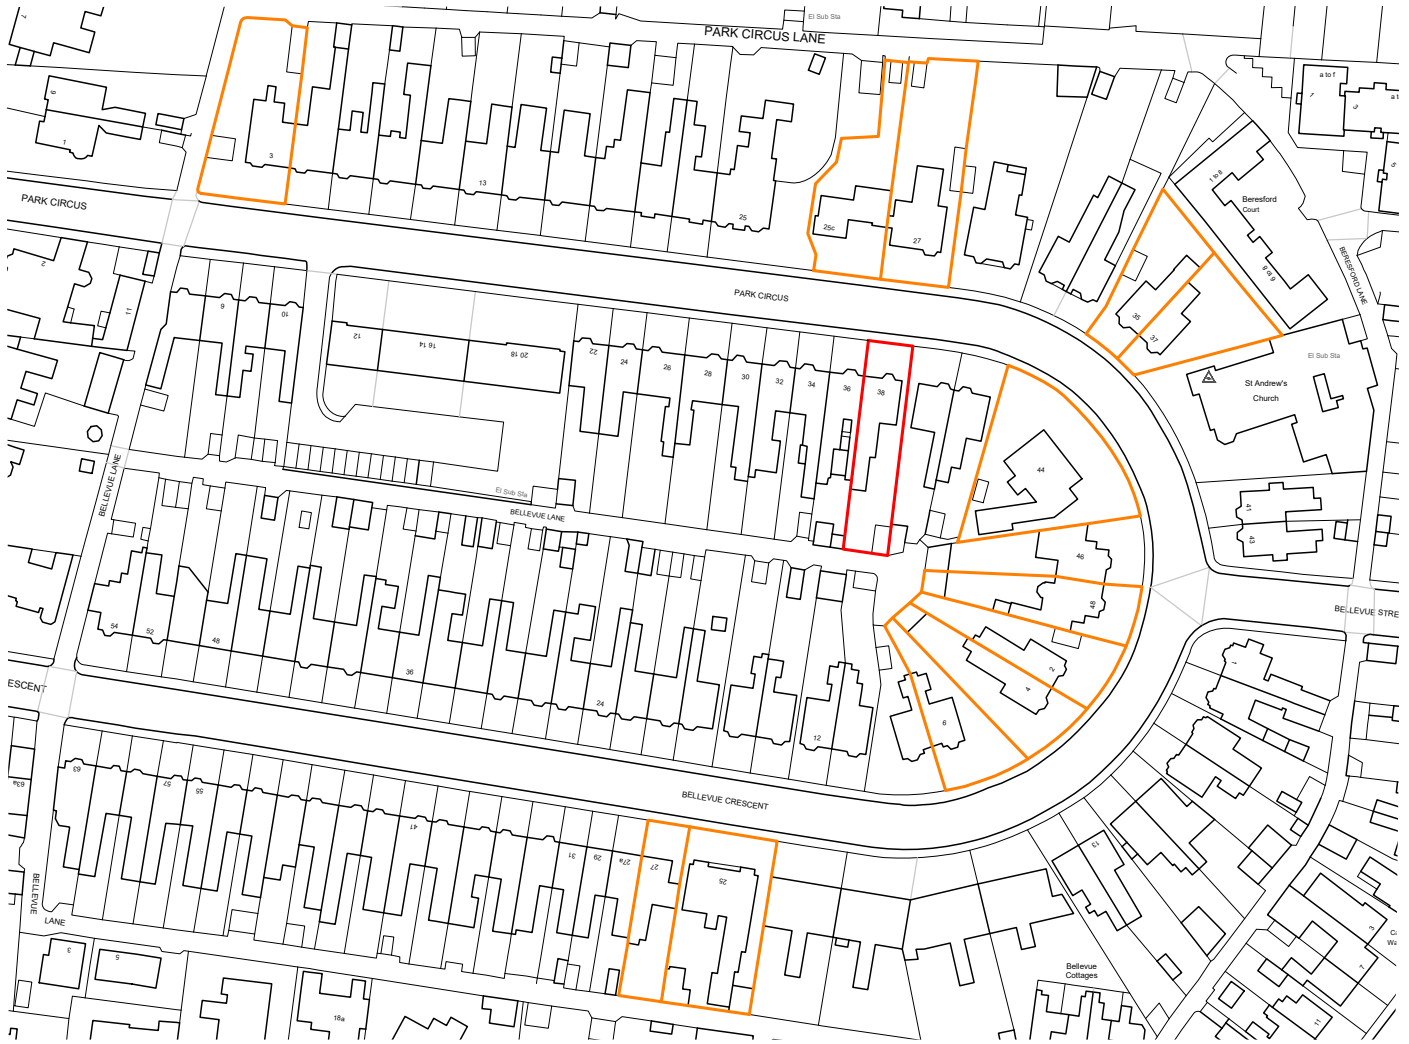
Plan showing surrounding properties with drive access including 3 Park Circus and 27 Bellevue Crescent.
